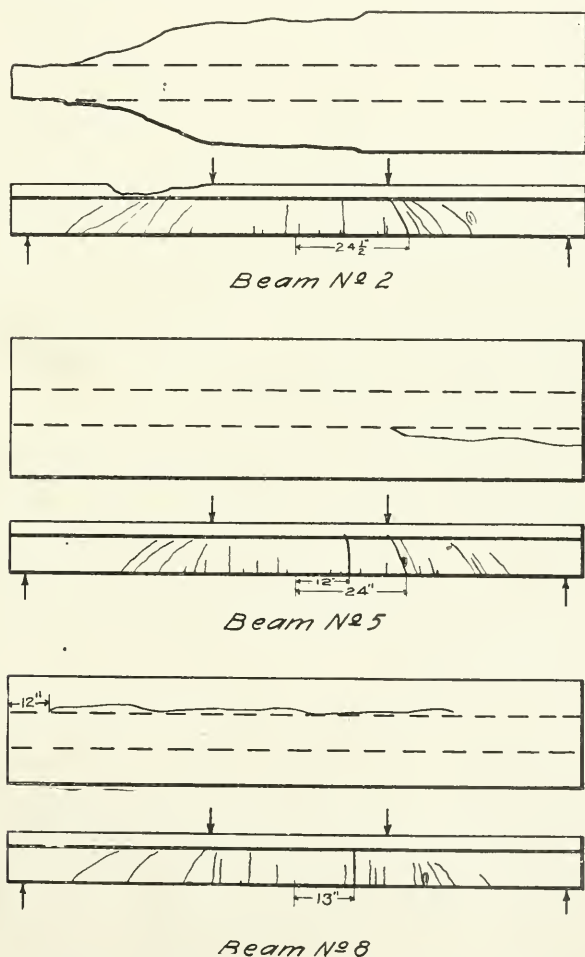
SKETCH OF BEAMS AFTER FAILURE.
